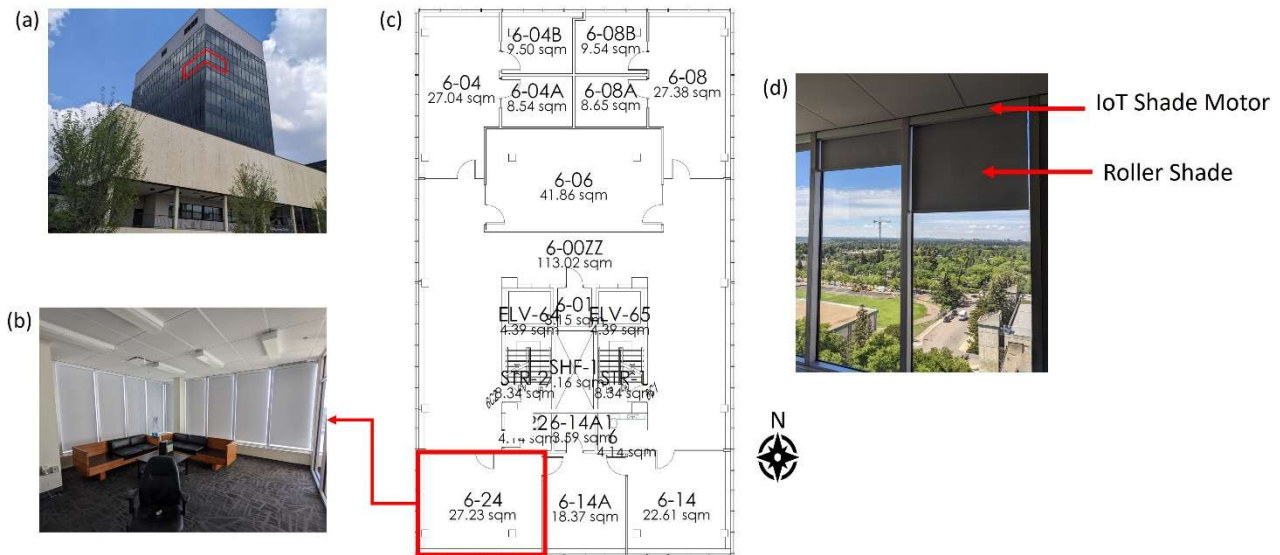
Test office space and floorplan of SUB 6-24 in the Students' Union Building in Edmonton, Canada. (a) Exterior view of the Students' Union Building at the University of Alberta with the test space exterior windows outlined in red. (b) Interior view of the SUB 6-24 office space with all roller shades in the fully deployed position. (c) Floorplan of the 6th floor of the Students' Union Building where the test space and associated room dimensions are outlined in red. (d) Roller shade prototype with components labelled.
